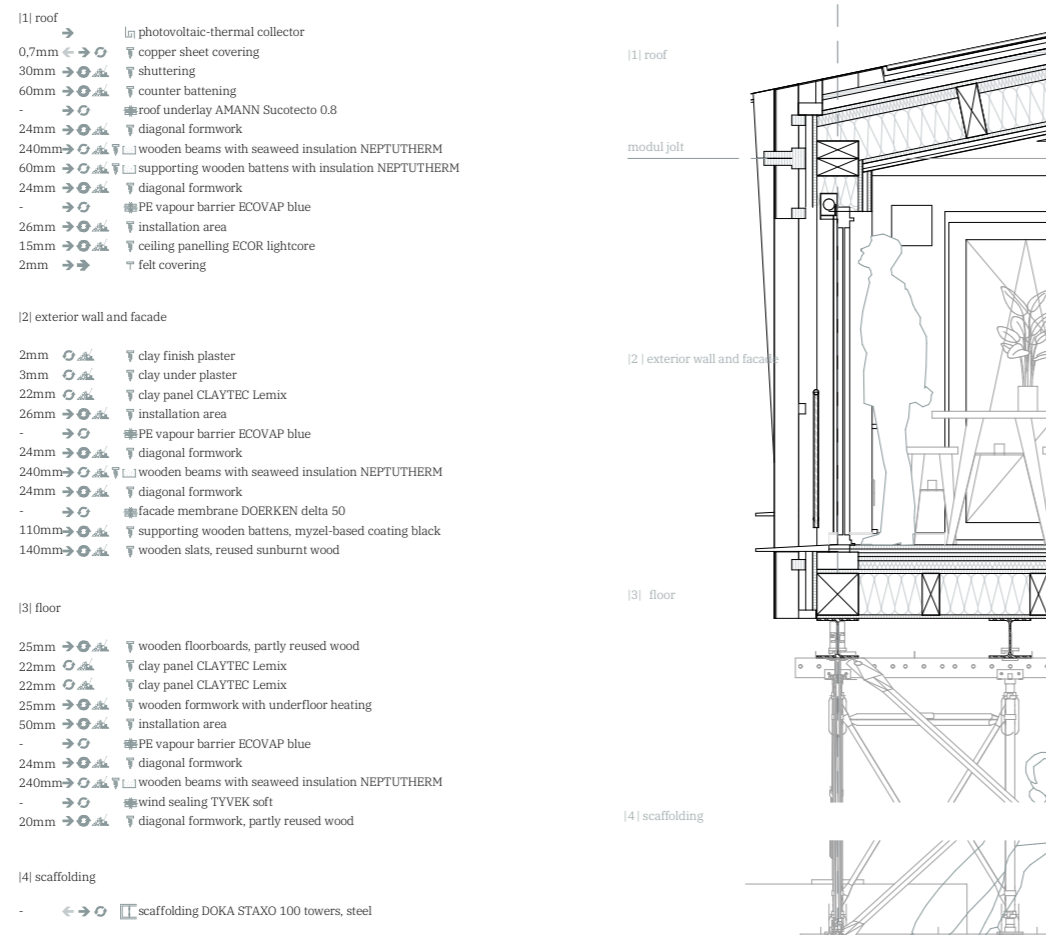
6. RoofKIT material application, Façade section HDU, 2022
